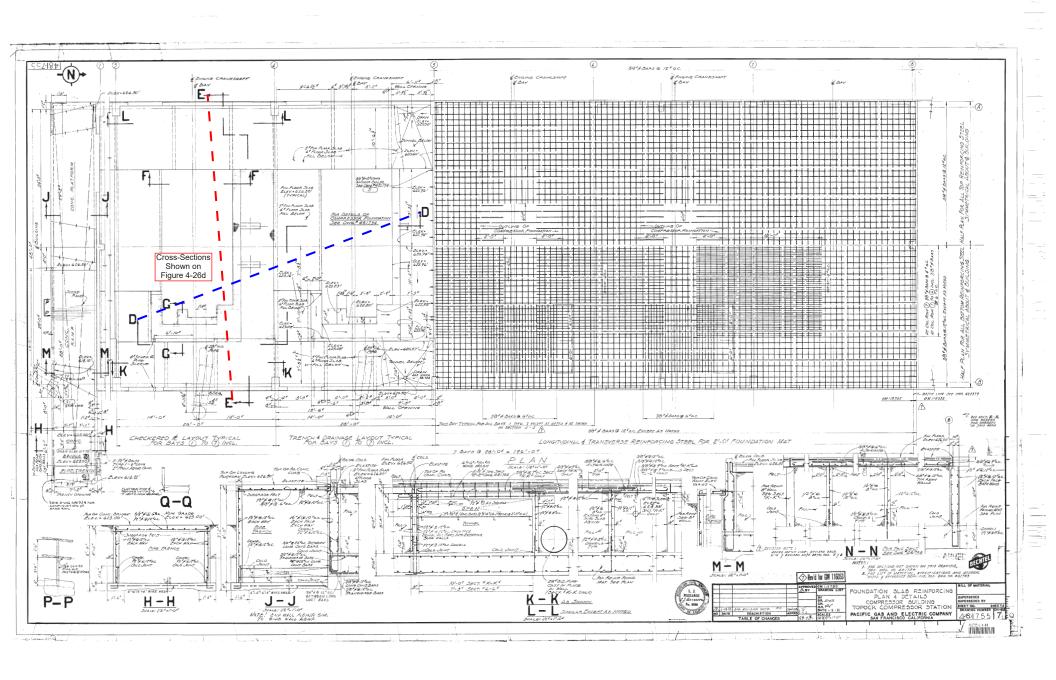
Engineering Drawing No. 481755, Rev. 7 (1953) AOC 25
